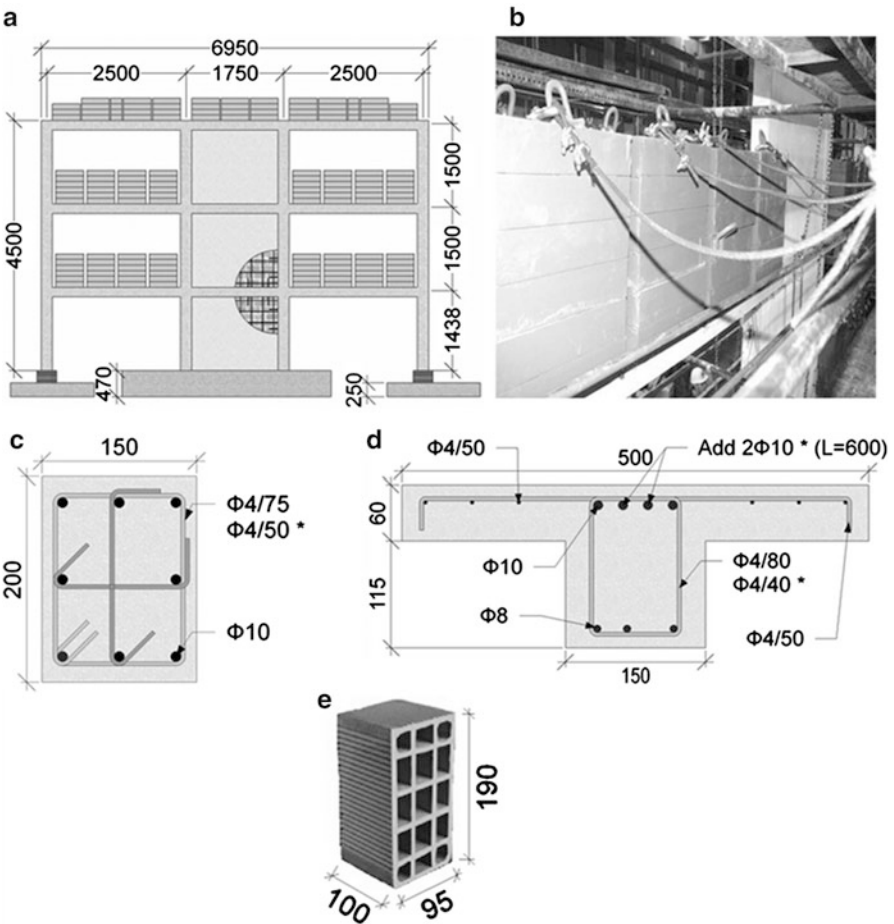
(a) Test frame, (b) steel blocks, (c) column, (d) beam section, (e) hollow clay tile brick (* denotes additional reinforcement and change in spacing in end region; dimensions in mm)
